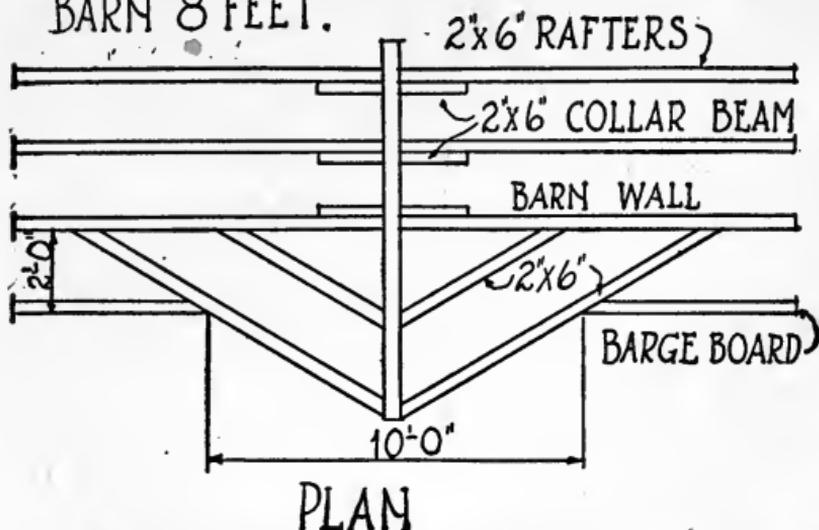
Top View of the Hay-Track Roof Extension Showing the Ridgeboard and Supporting Jack-Rafters
